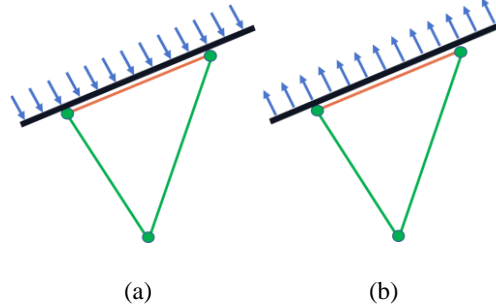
Loading condition. (a) Wind pressure, (b) Wind suction.
